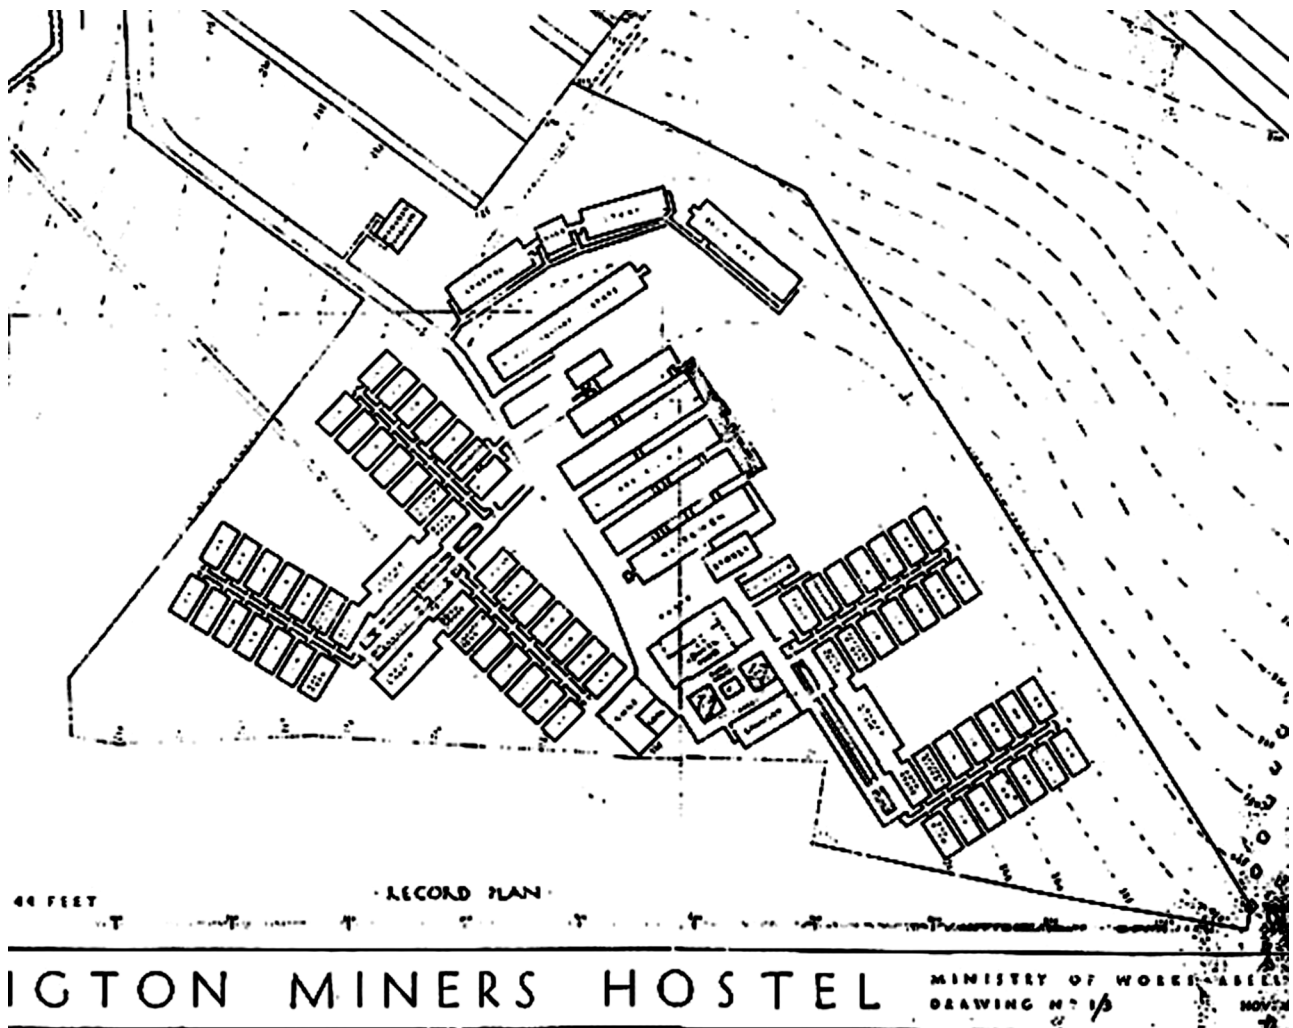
Extract from the 1944 Ministry of Works plan of the hostel site.
